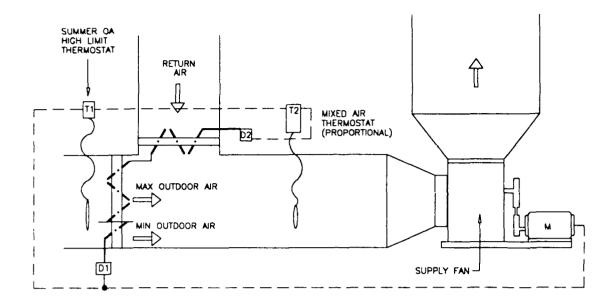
All-season ventilation control with fixed minimum outdoor air plus additional outdoor air when feasible. (Reprinted by permission of ASHRAE from the 1987 ASHRAE Handbook—Systems.)
